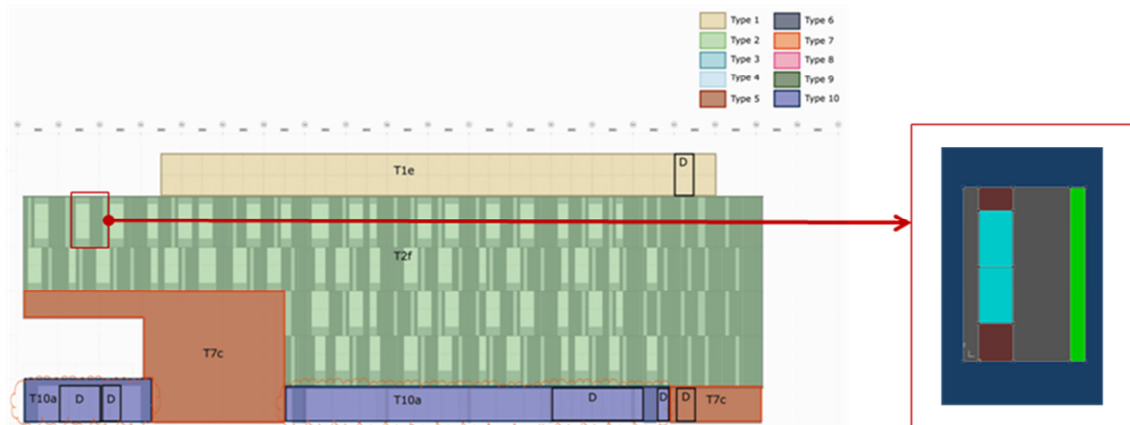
An elevation of Oxford Brookes. The section of the façade used in the test is highlighted with a red rectangle. (Image on left generated by Ramboll Façade Team)
